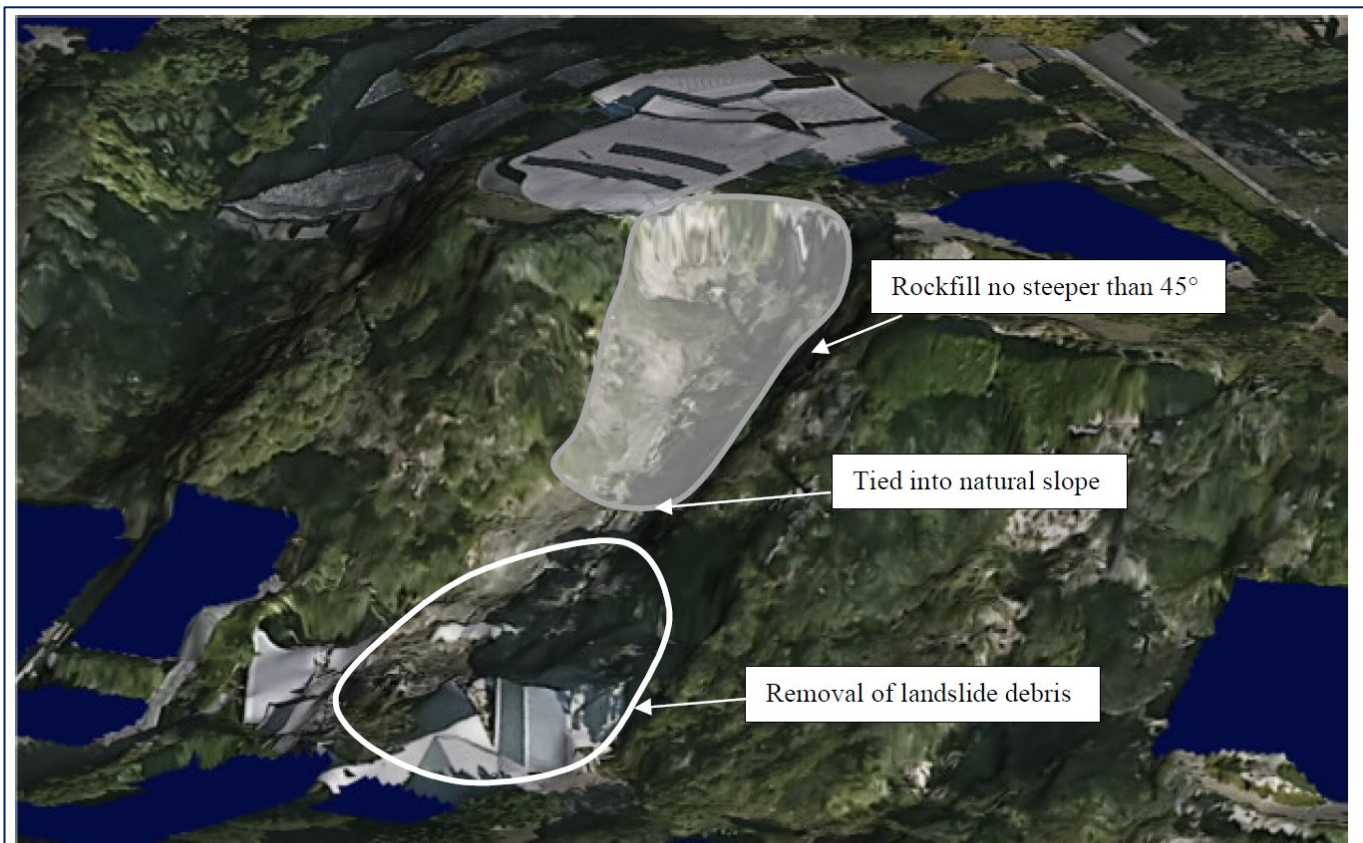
3D image showing possible extent of rockfill required to reinstate zone of depletion arising from the 2025 landslide.
